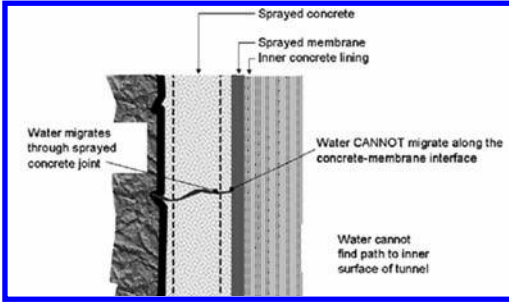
Fully bonded Masterseal® 345 waterproofing membrane preventing the migration of water along the concrete-membrane interface.
